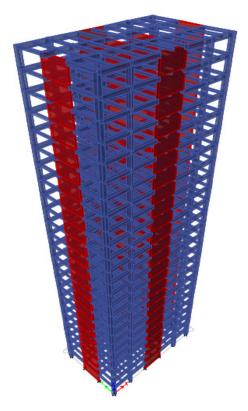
Orthogonal view of RC frame with Shear Wall in ETABS
